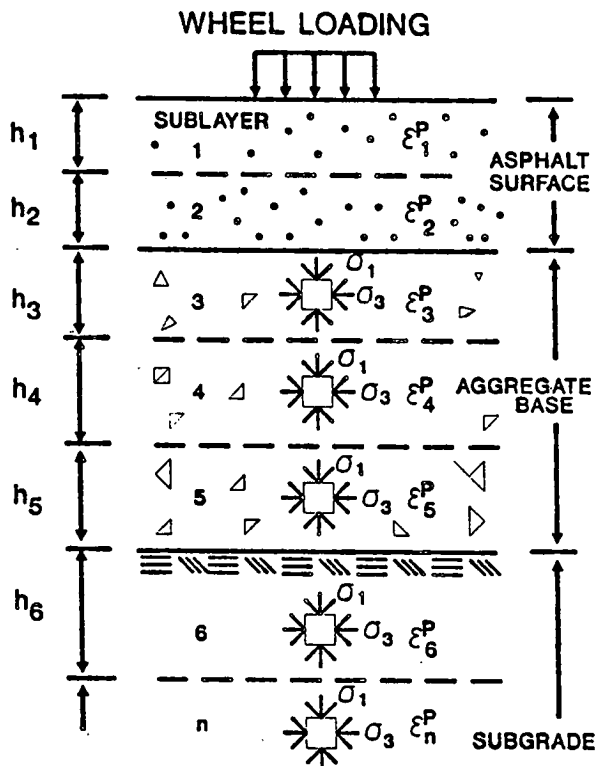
Idealization of Layered Pavement Structure for Calculating Rut Depth (After Barksdale, Ref. C-9).
